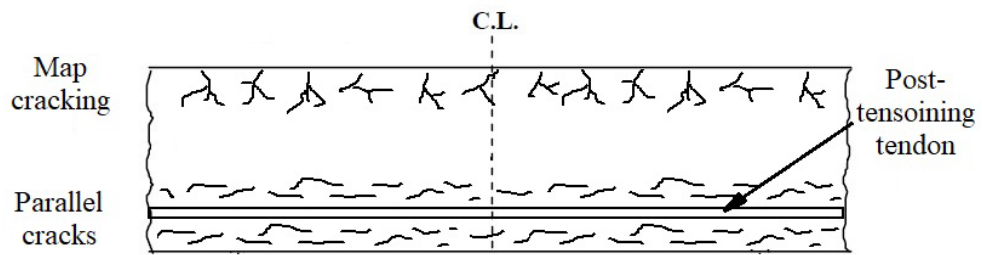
Schematic of ASR cracking in prestressed concrete beam.
